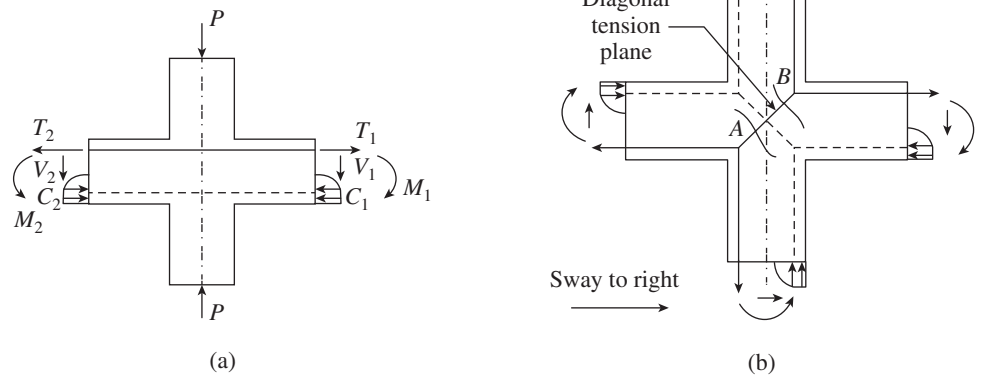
Forces in interior beam-column joints (a) Gravity loading (b) Seismic loading
